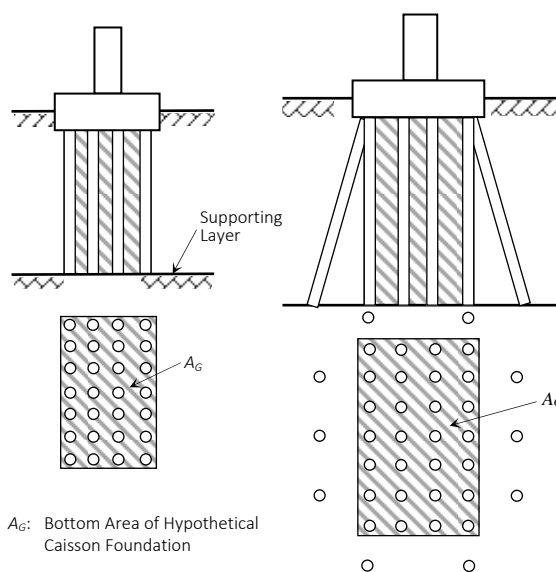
Hypothetical Caisson Foundation
